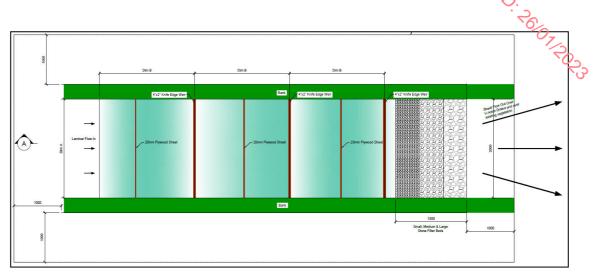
Plan View of Settlement Ponds (with Discharge to Drains where Applicable)
